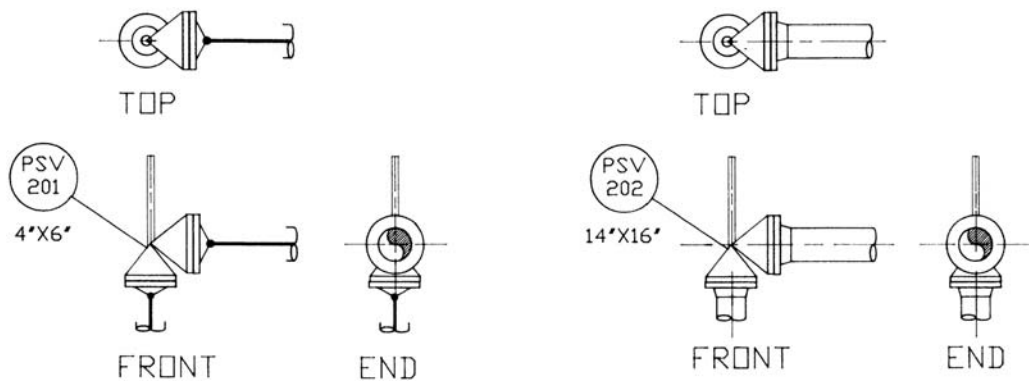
Relief and pressure safety valve drawing symbols.
